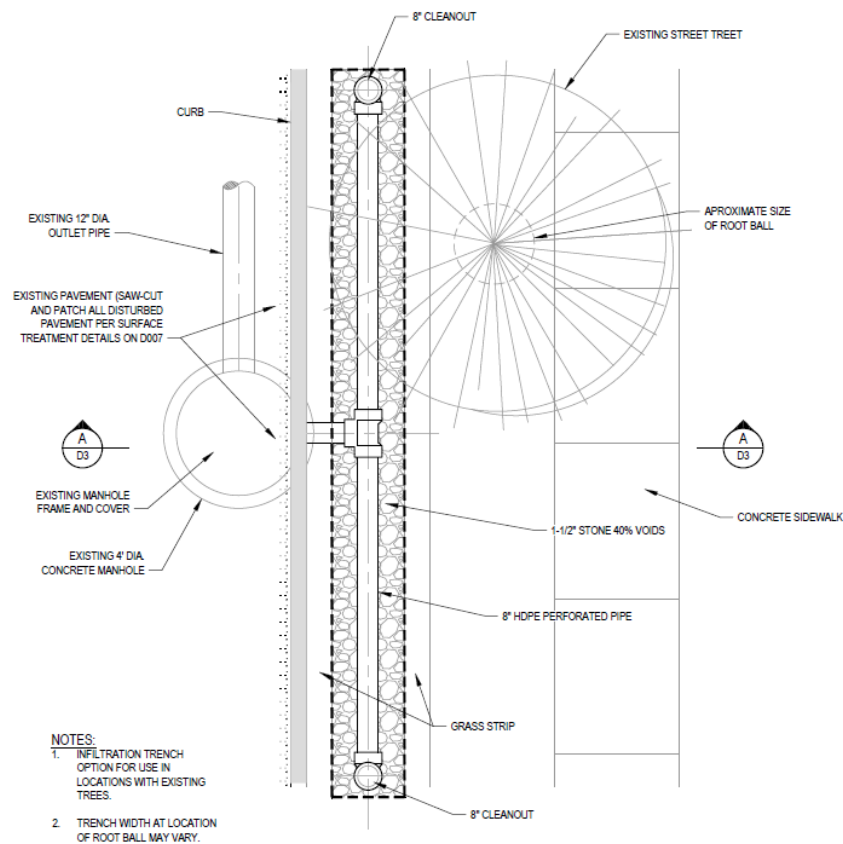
Engineering Detail for Lincoln Street North, Tree Planter BMPs 3.1 -3.4
